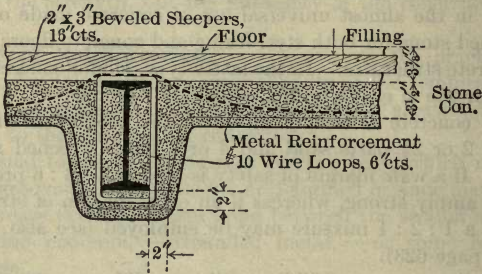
Paneled Floor Construction, Reconstruction of U. S. P. O. and Custom House, Richmond, Va.
